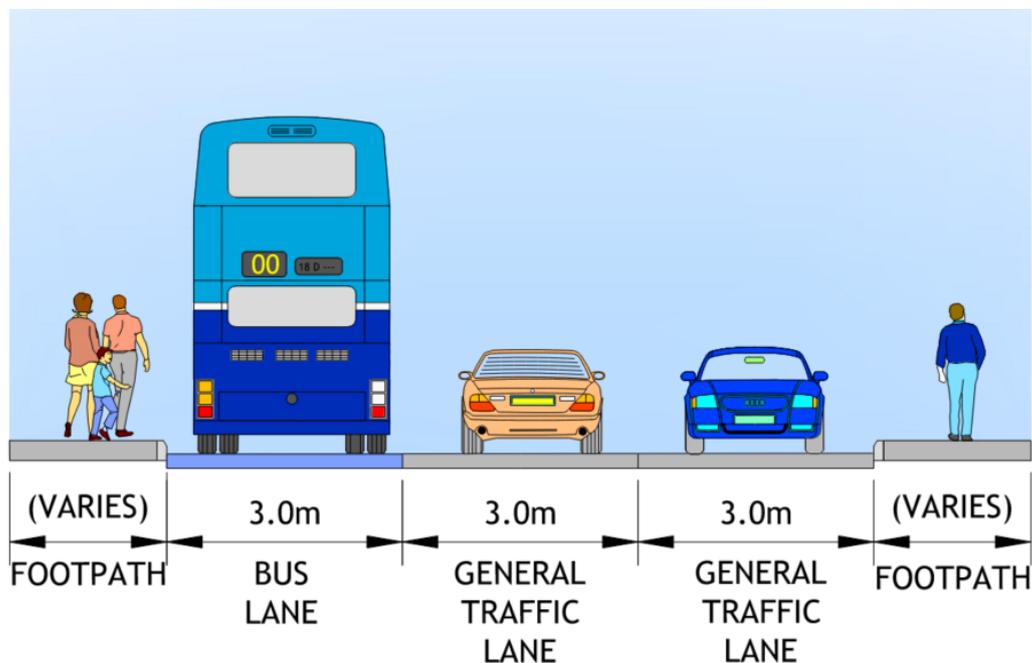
Cross-Section B-B (relevant to RF1 and RF2)
